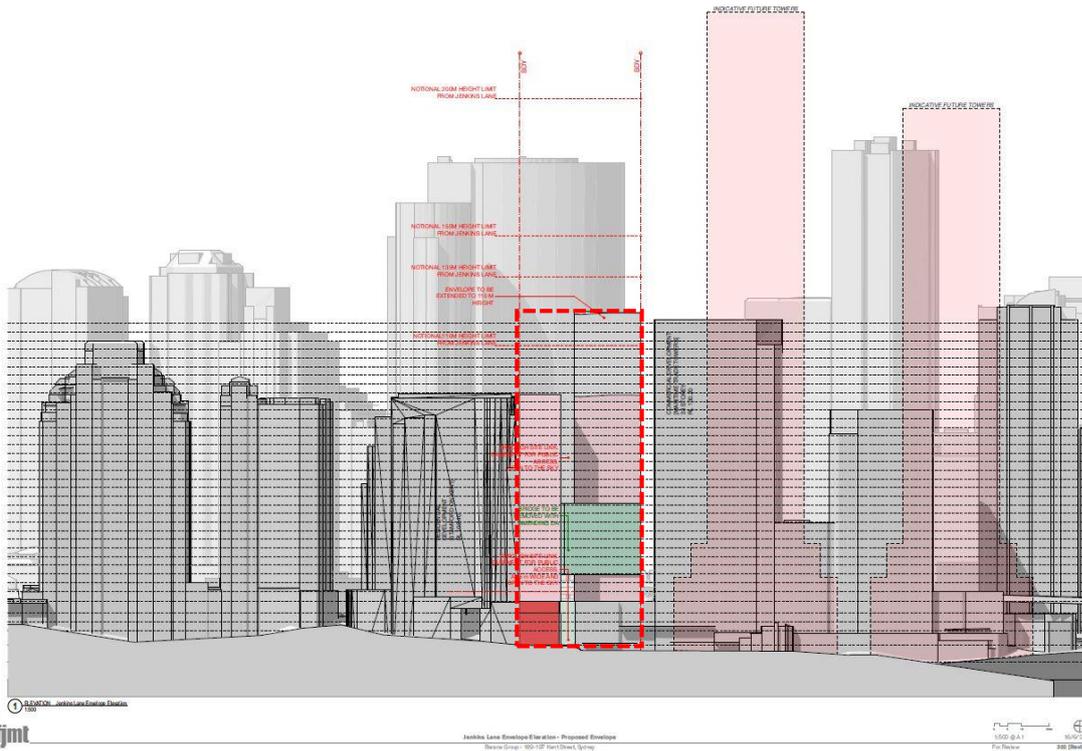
Proposed west (Jenkins Street) envelope elevation, depicting the subject site boxed in a dashed red line, the approved envelope (shaded pink and red), the proposed envelope addition (shaded grey) and the envelope area to be deleted (shaded green)
